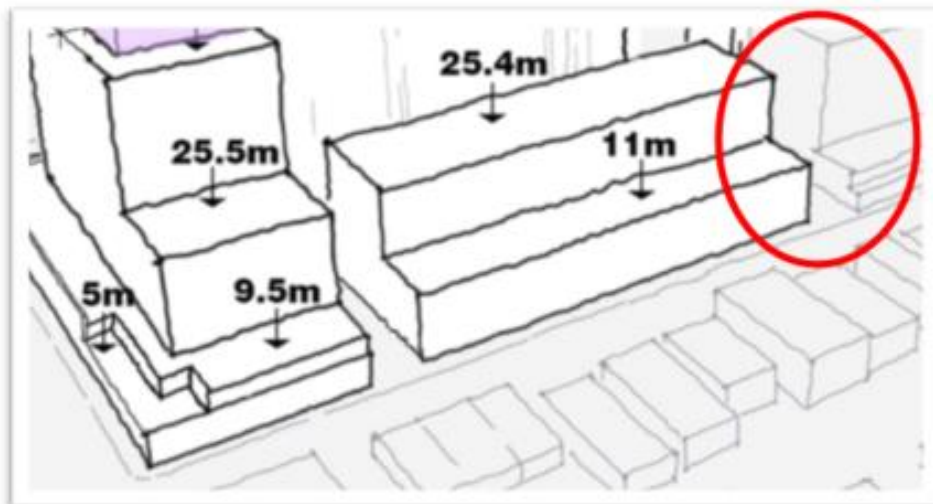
Proposed built form layout as per DP. Source: Development Plan (Gurner 2023)
